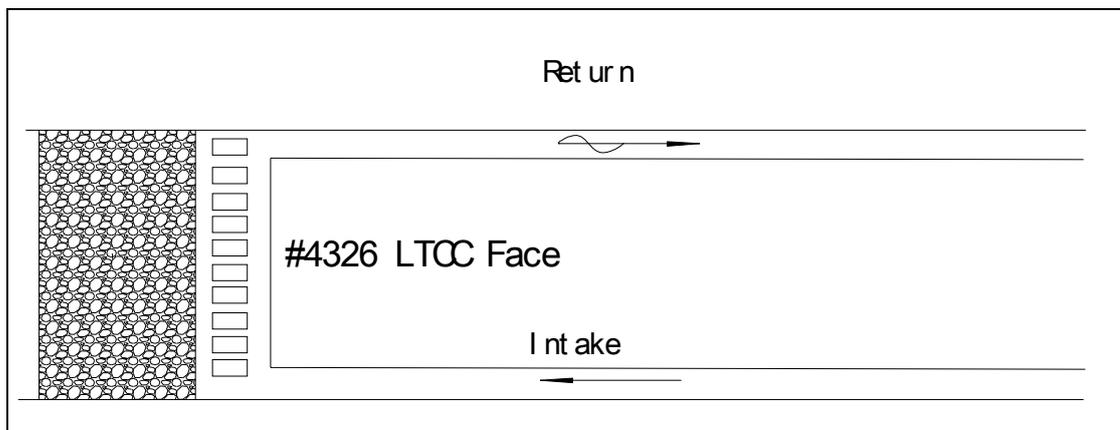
Layout of #4326 LTCC face, Xinglongzhuang mine
